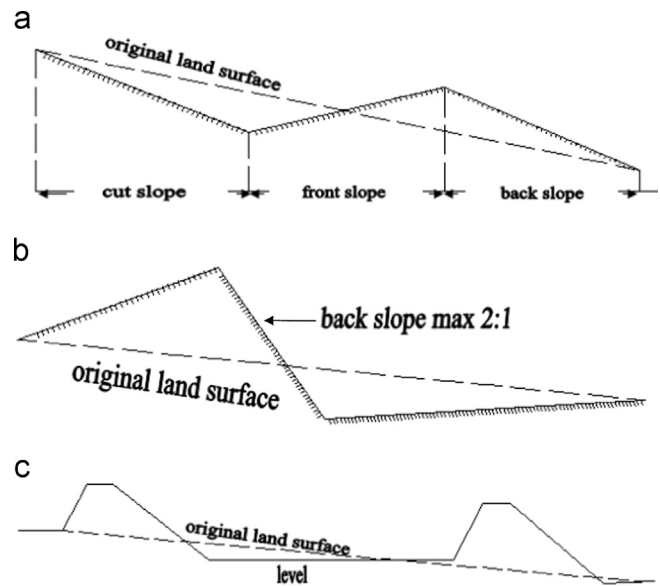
Typical terrace cross section; a – broad base, b – steep backslope, c – bench.
